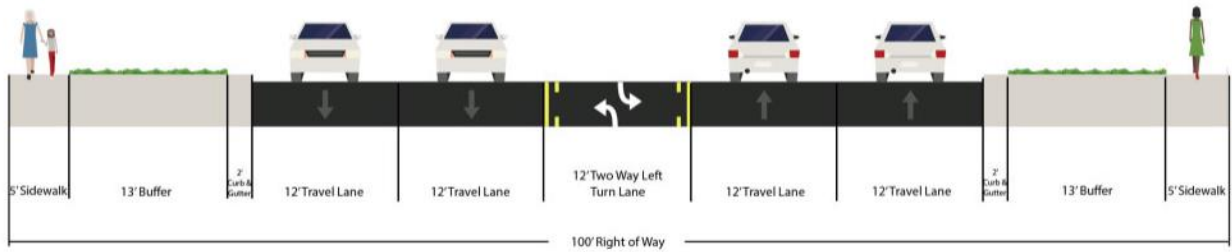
, 2.2 and 2.3 TYPICAL ROADWAY SECTIONS
